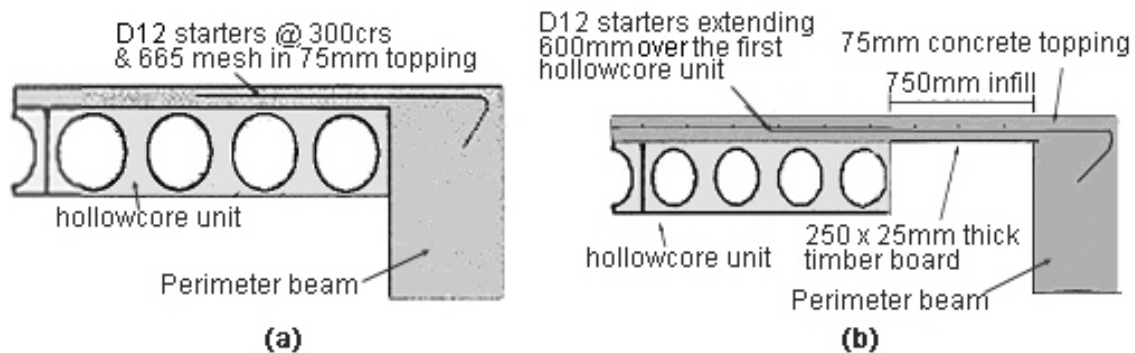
Modelled slab-side beam connections (a) without cast in-situ infill (b) with cast in-situ infill (not to scale)
